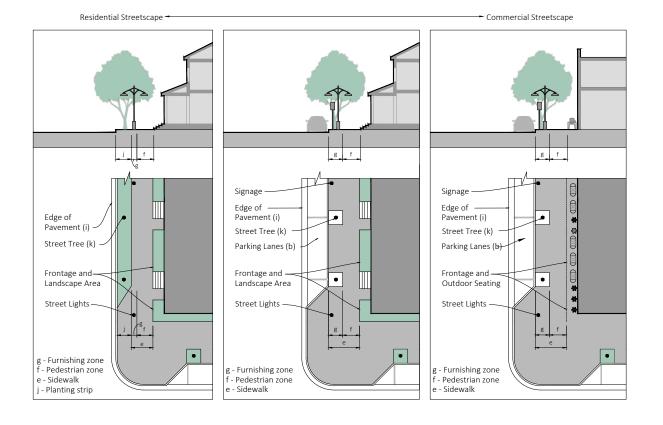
Residential streetscape conditions for townhouses in Delray Beach
